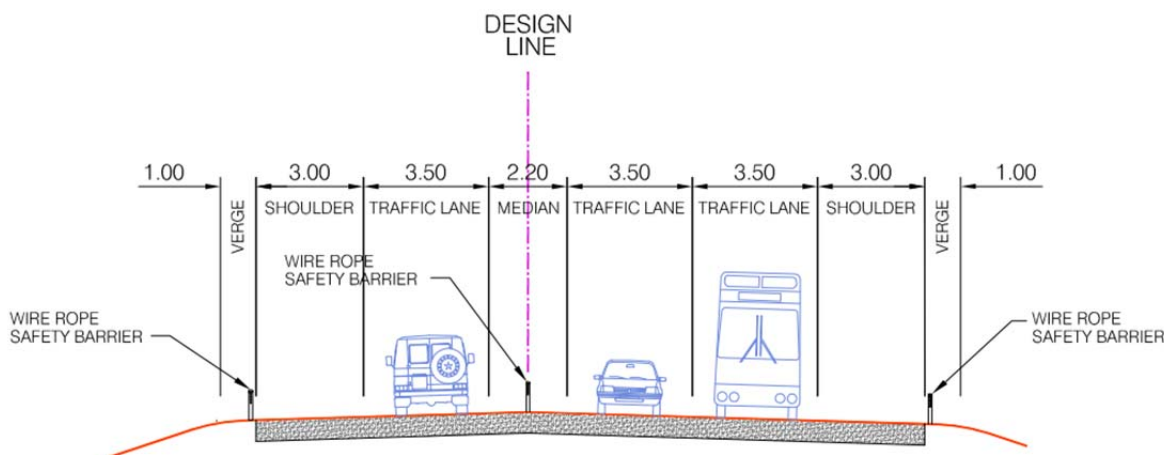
Typical cross section – Drysdale Bypass (7)
